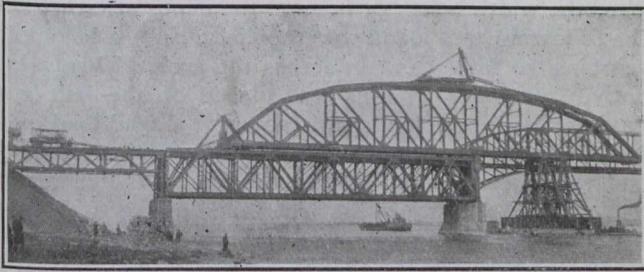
Span During Launching, Showing Hauling Apparatus.
